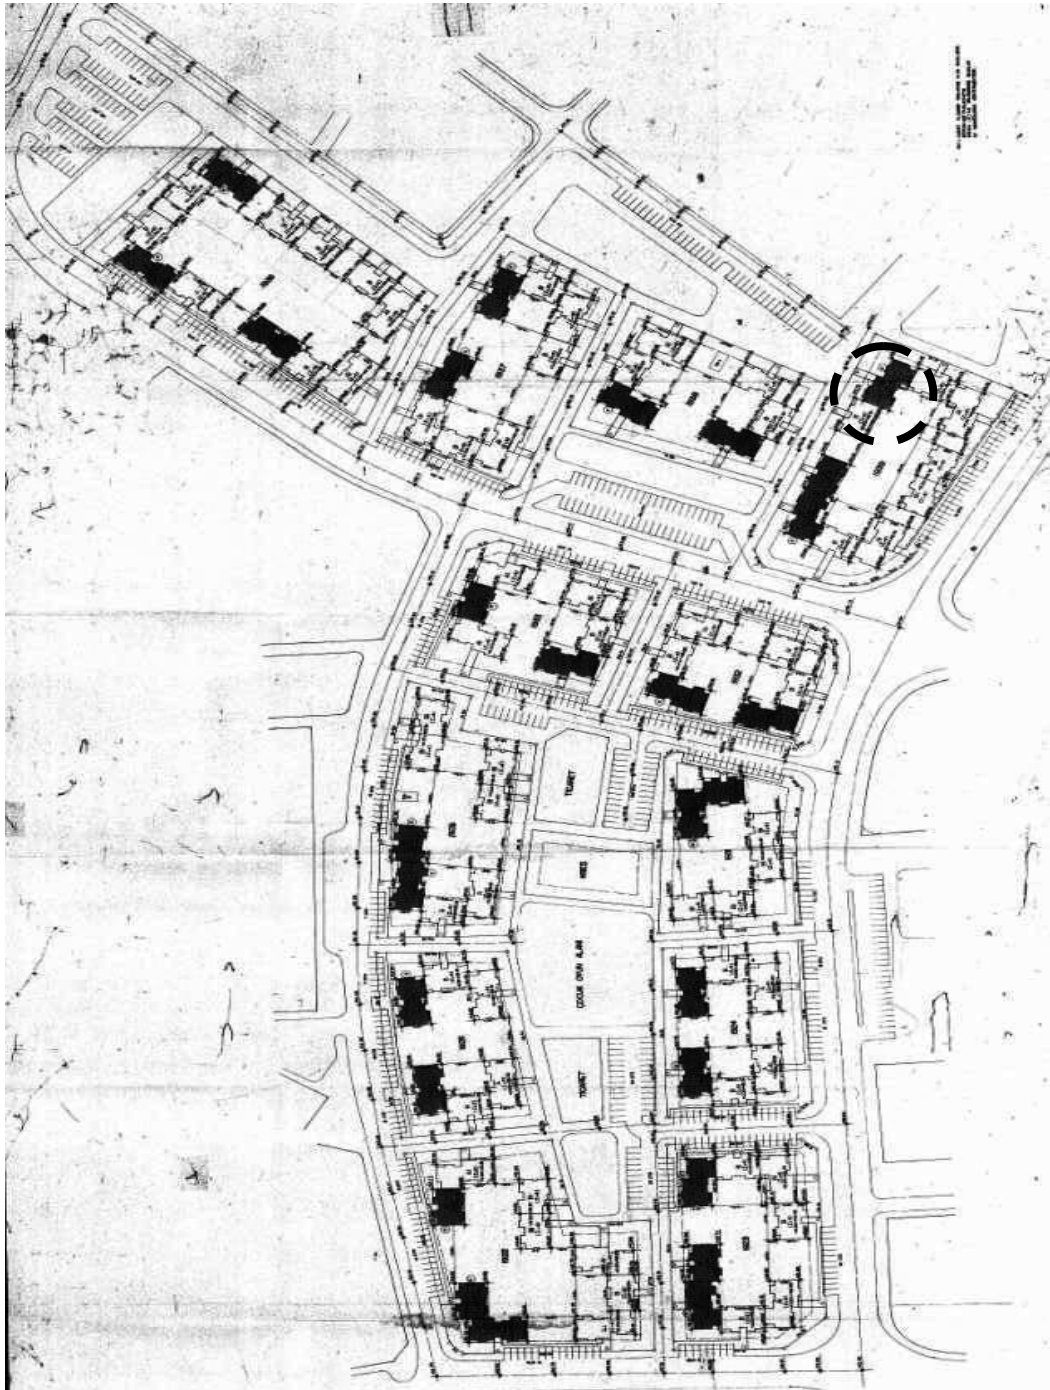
Site plan of Gazimir Emlak Bank Housing Area (Second Development Phase)
